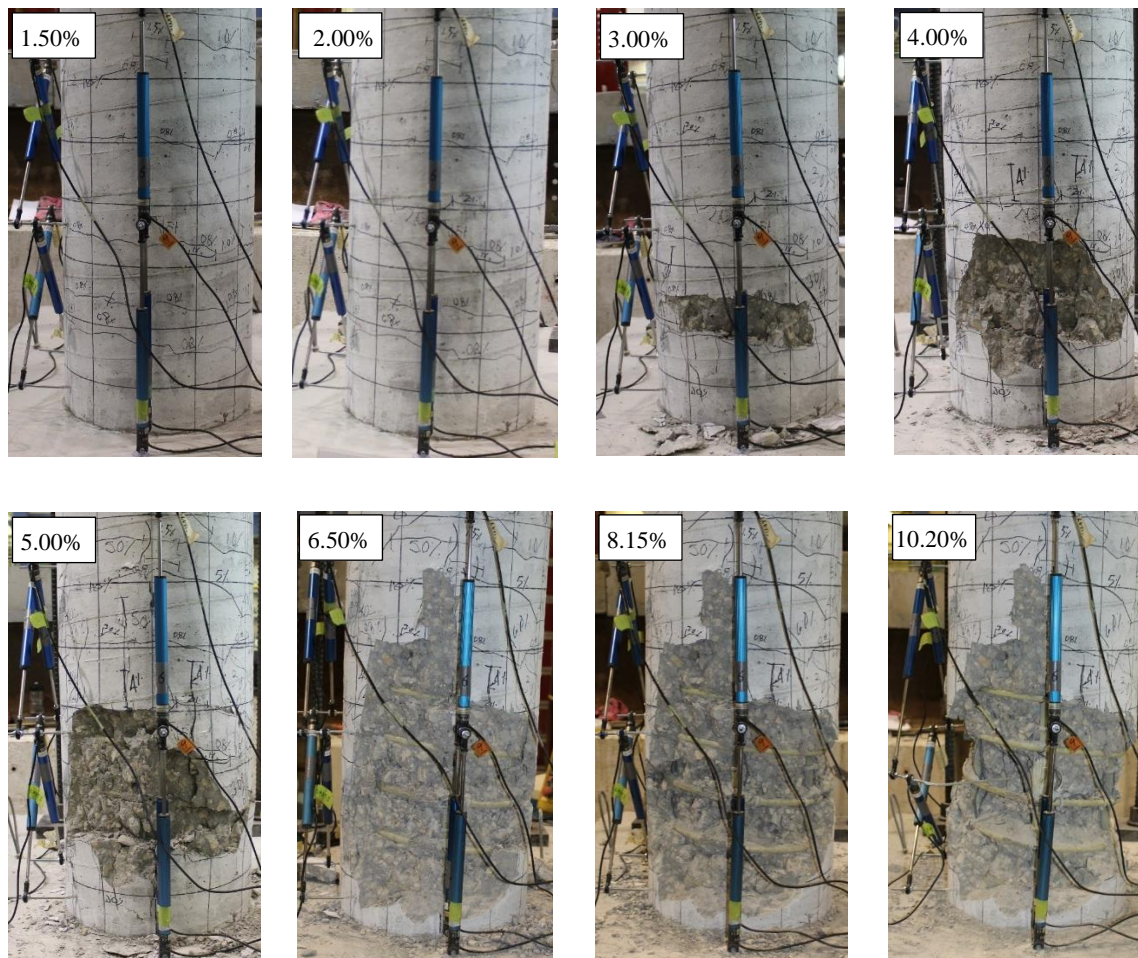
Typical sequence of failure for test specimens - Specimen G-0.2-85s-XX
